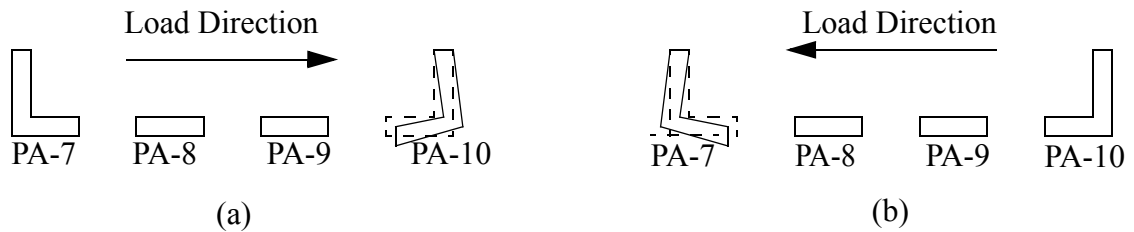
Plan view illustrating the out-of-plane behavior of piers PA-7 and PA-10 in the (a) positive and (b) negative loading directions.
